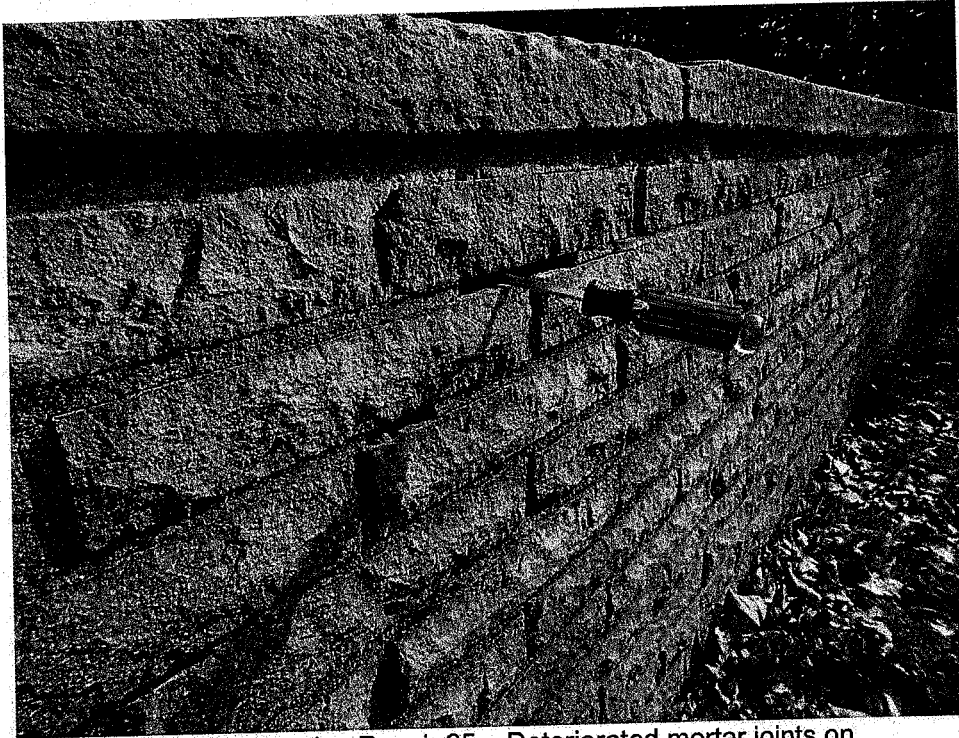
Routine Repair 25 – Deteriorated mortar joints on masonry retaining wall – Site, Grid G-1/8
